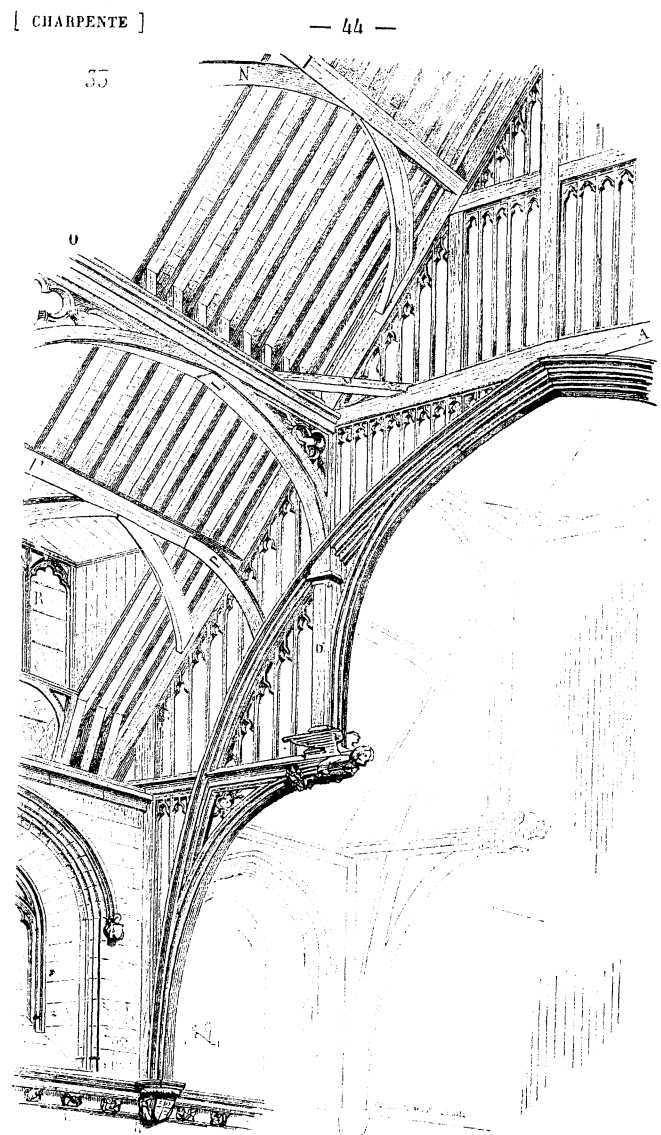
Westminster Hall. Roof and truss design showing roof framing (drawing by Viollet-le-Duc, Dictionnaire raisonne, c. 1850, III).
